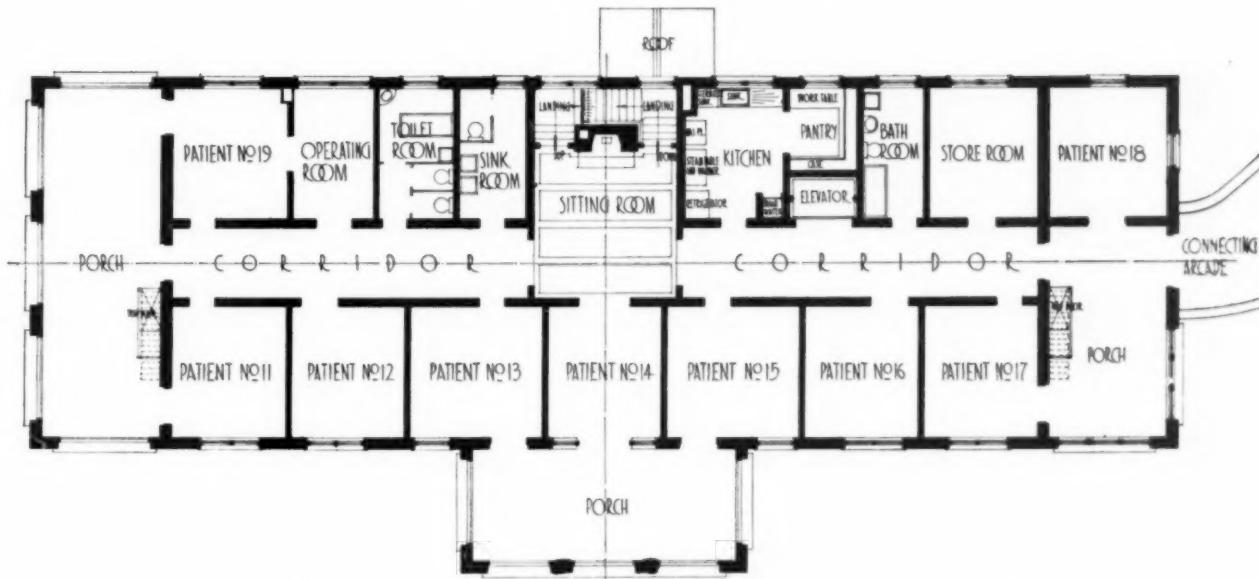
Nopeming Hospital for Tuberculosis. Infirmary building. Second floor plan.
